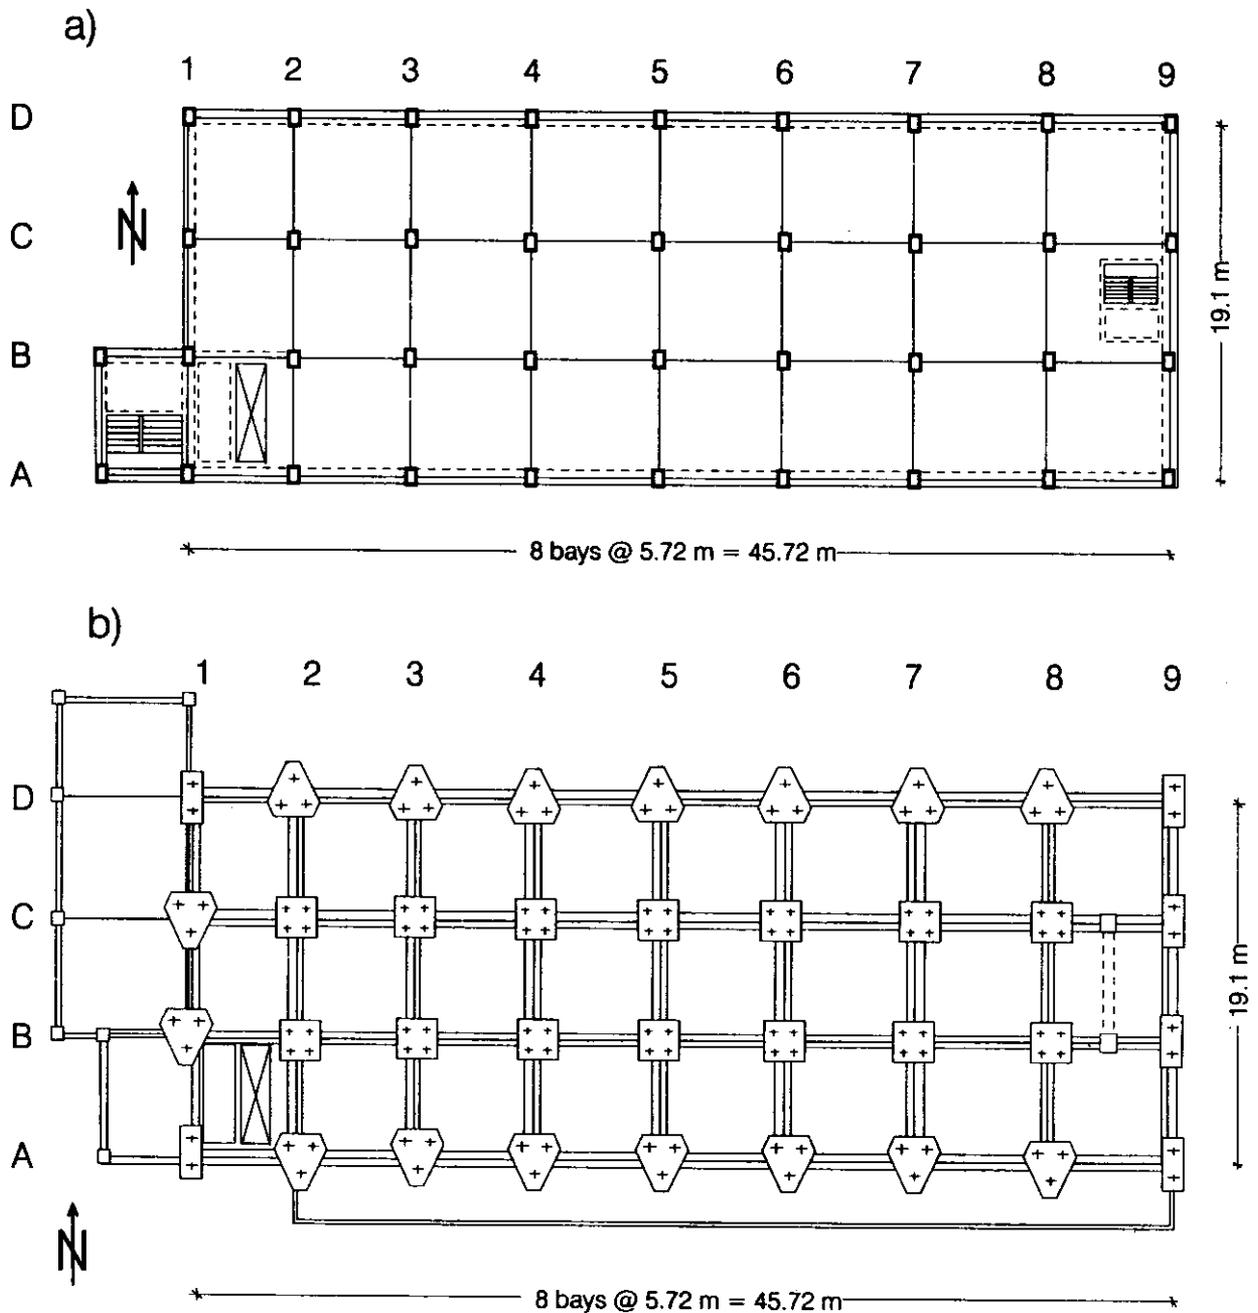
VN7SH building: (a) typical floor plan (b) foundation plan (Contd.)
